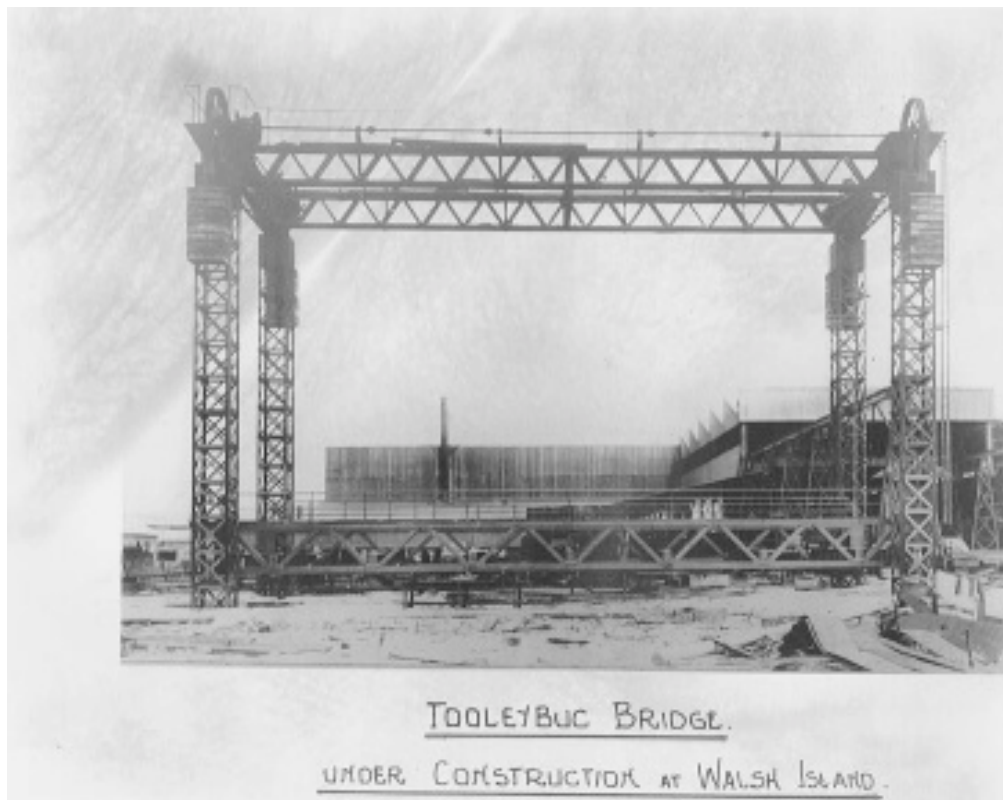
Tooleybuc Bridge lift tower under construction at Walsh Island Dockyard and Engineering Works, Newcastle (Source: Digital Hunter 03600079)
